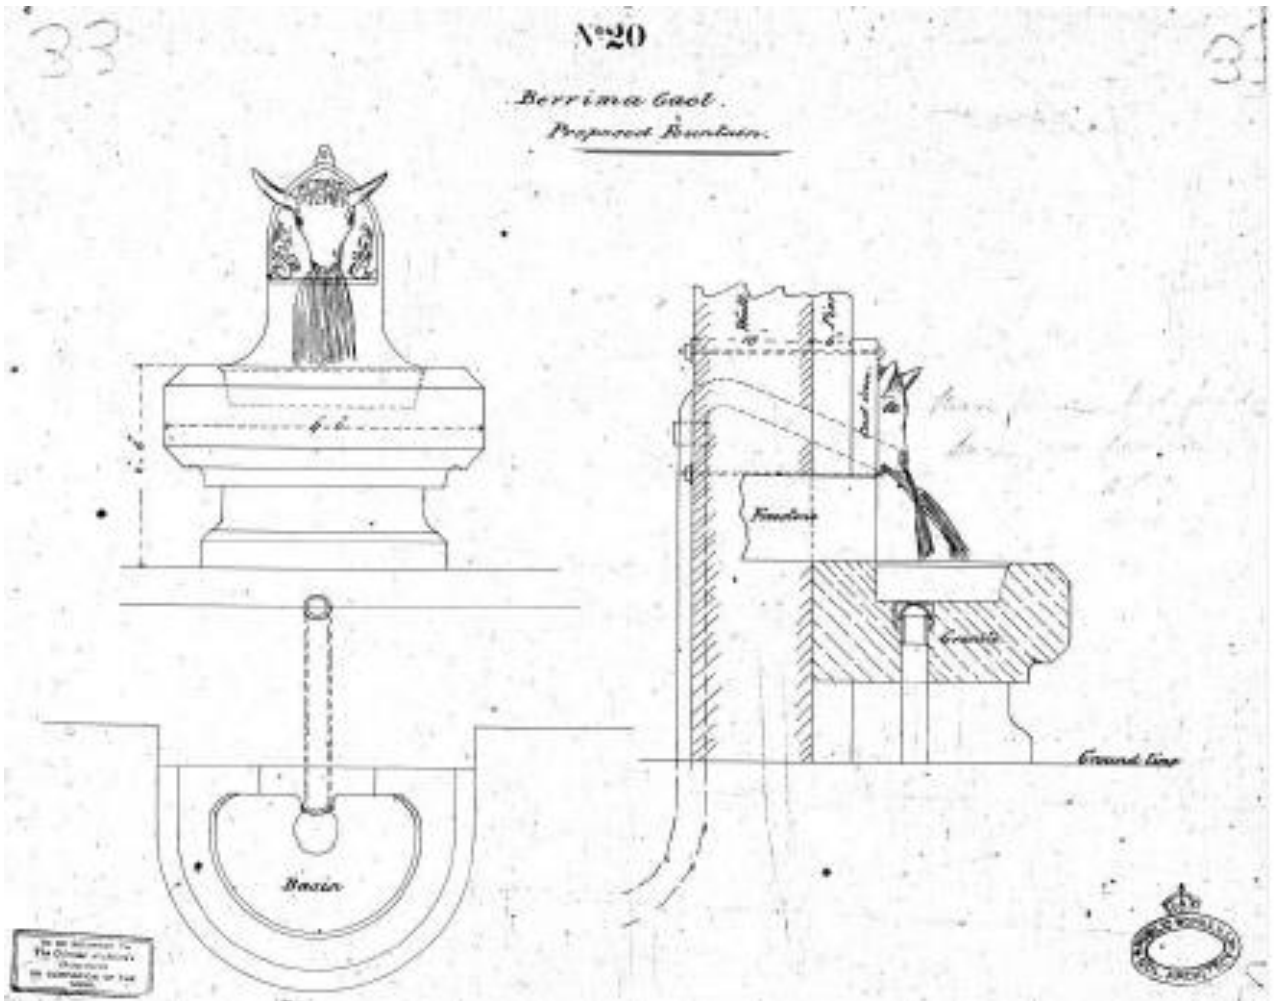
1877 plan for the Bull's Head Fountain, located at the exterior northern compound wall.
